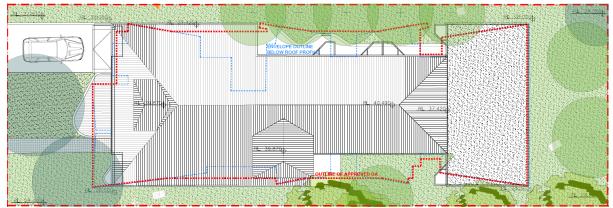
Site plan showing approved building footprint (blue dotted line) and the proposed building footprint. The red dotted line indicates the footprint of the refused scheme.
